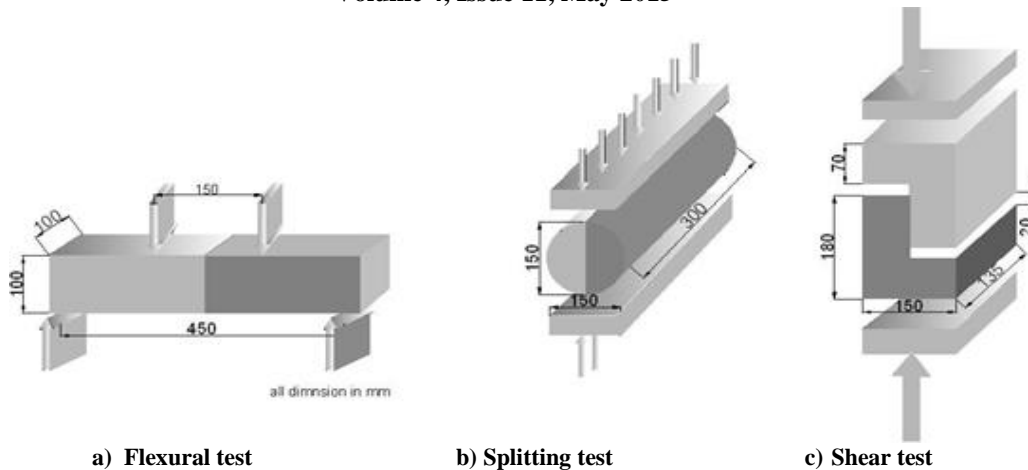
Dimensions of tested specimens (in millimetres) and test methods.
